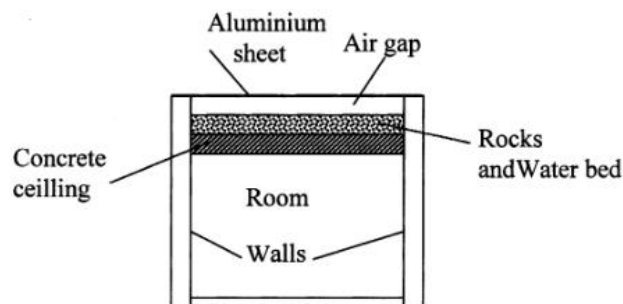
Water-based open system RC on the roof of a building (Ben Cheikh and Bouchair, 2004).
